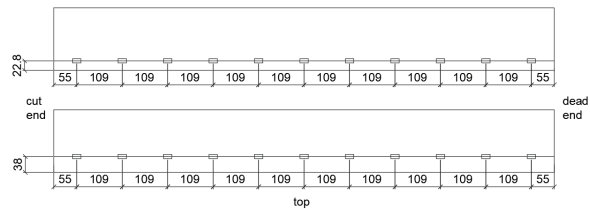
Concrete strain gauge arrangement(unit : mm)
